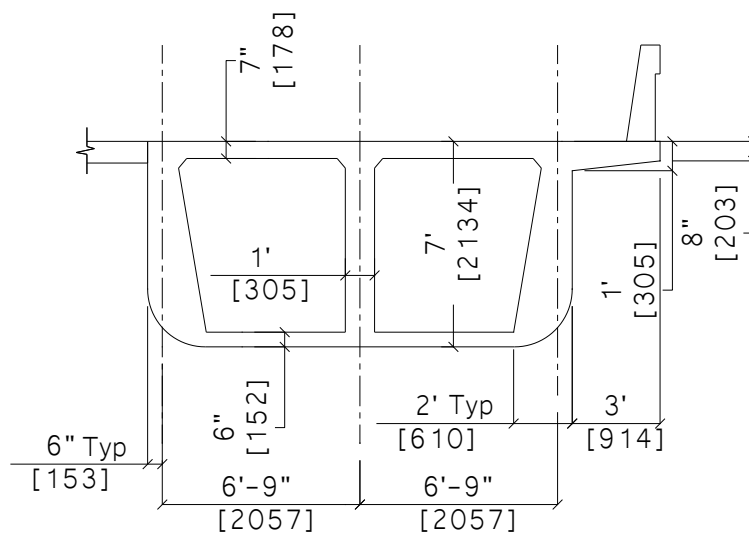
Superstructure cross-sectional details of Frame 3 and 5, Bridge 5WB
